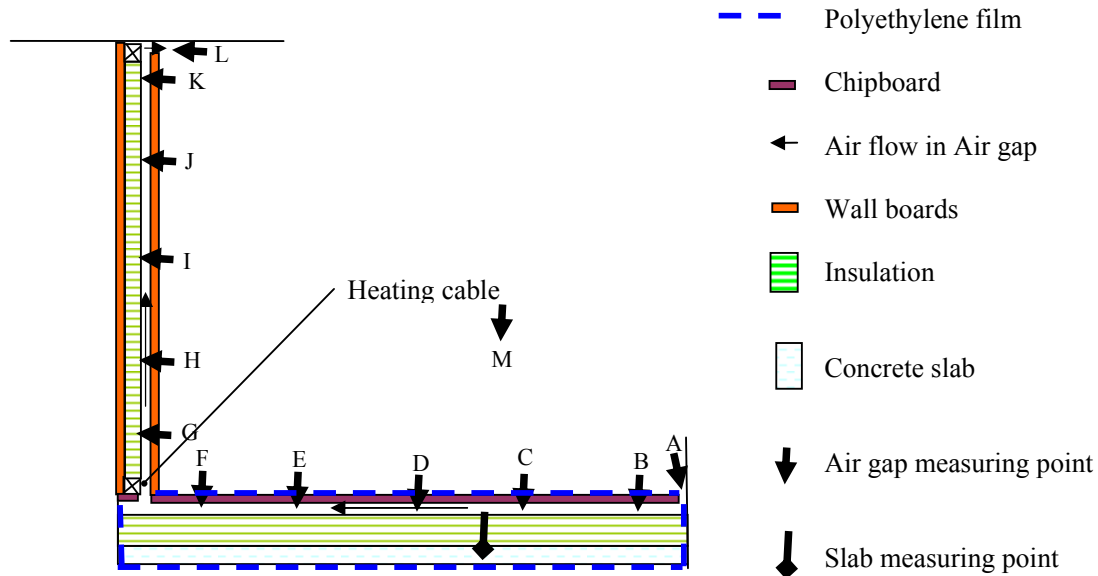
Schematic cross-section of an ordinary of wall and bottom floor construction used in the extra *RH* studies, supplied with measurement points for *RH* and *T* in concrete slab and in floor.
